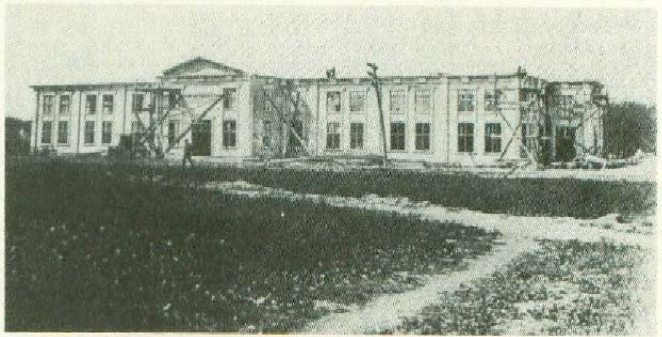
Concrete Mess Hall Building at Camp Perry, Ohio
